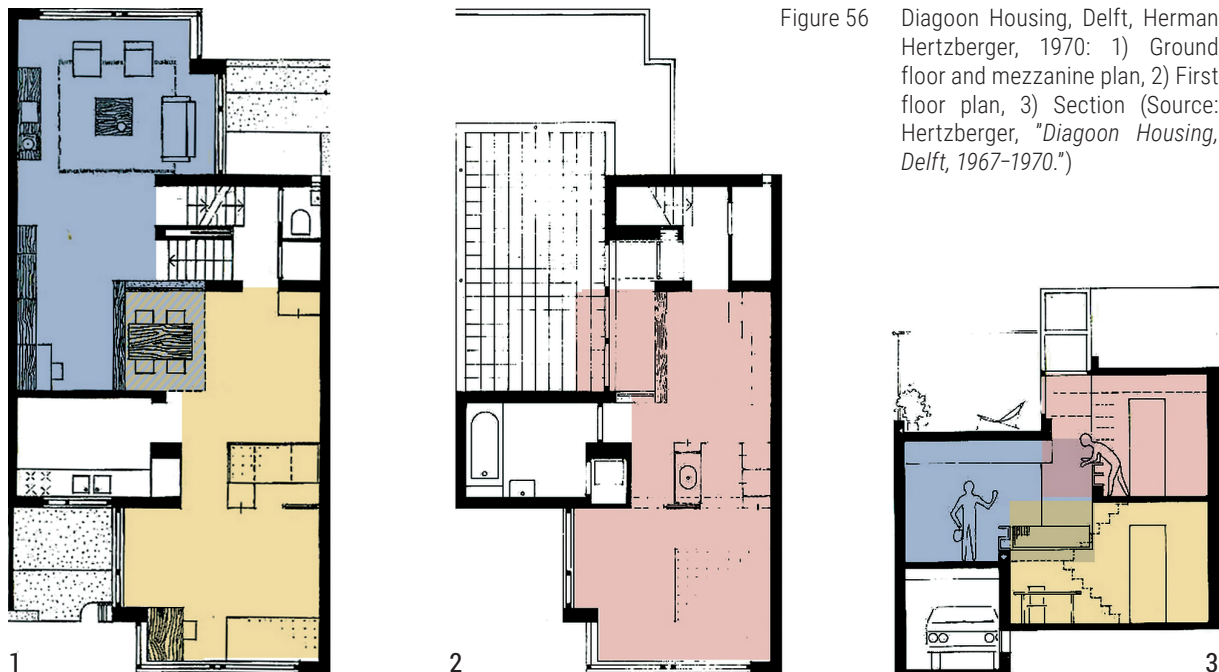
Diagoon Housing, Delft, Herman Hertzberger, 1970: 1) Ground floor and mezzanine plan, 2) First floor plan, 3) Section (Source: Hertzberger, "Diagoon Housing, Delft, 1967-1970.")
